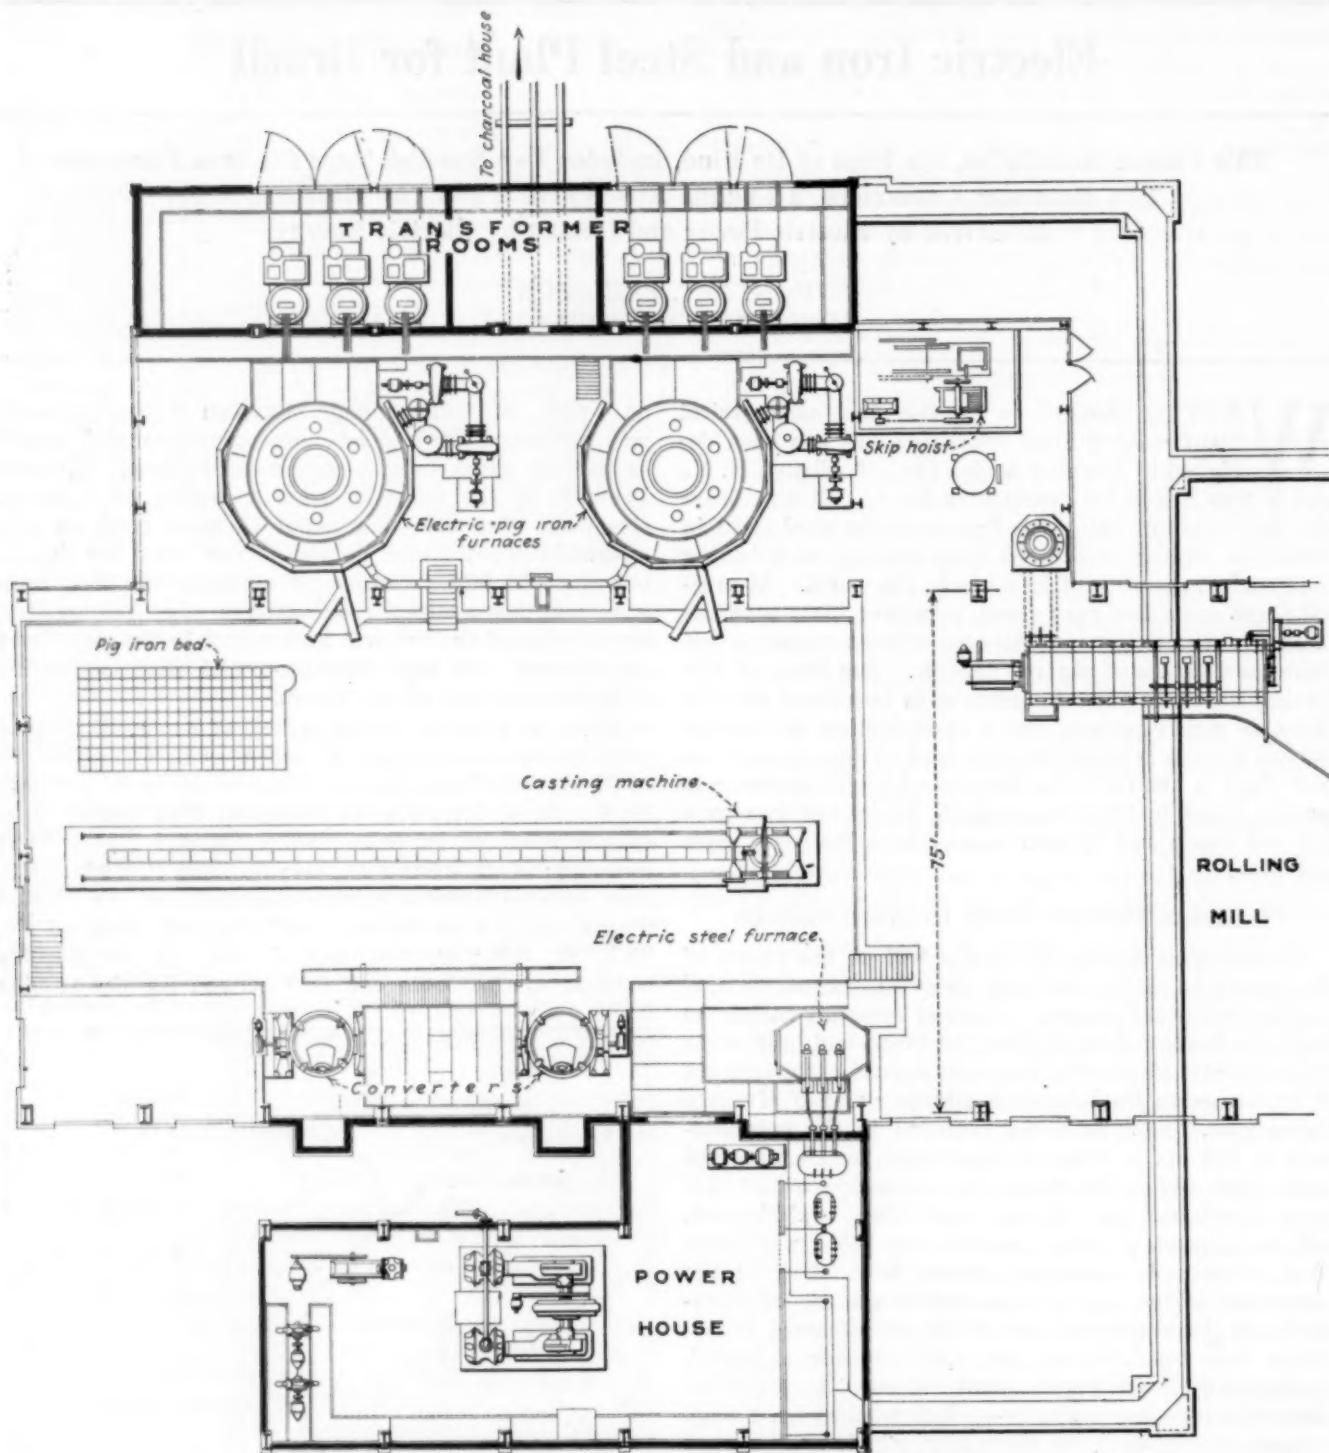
GROUND PLAN OF IRON AND STEEL PLANT
